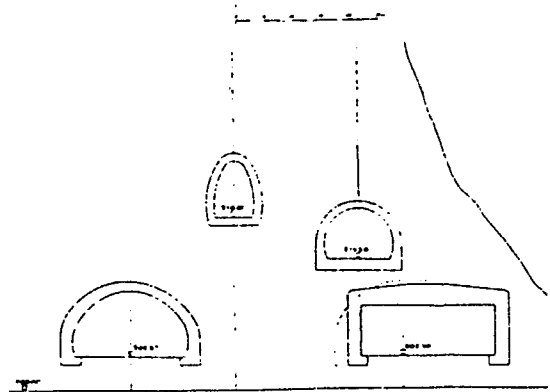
A typical cross section(A-A) of multiple tunnels and junction widened area. (After M.Cravero et al.)
